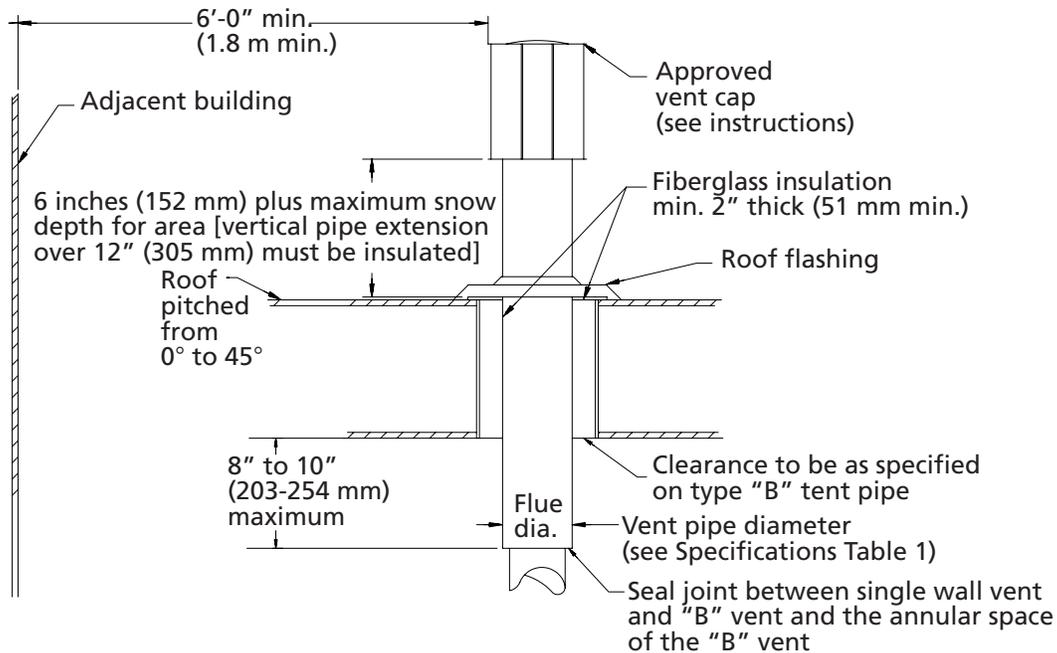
B – Vertical Arrangement – Single Wall Vent System to Double Wall Termination
